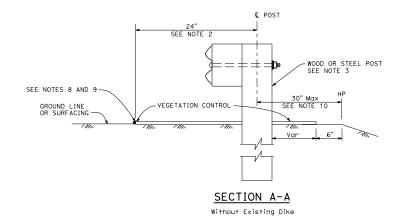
DETAIL ON REVISED STANDARD PLAN RSP A77N12 -
